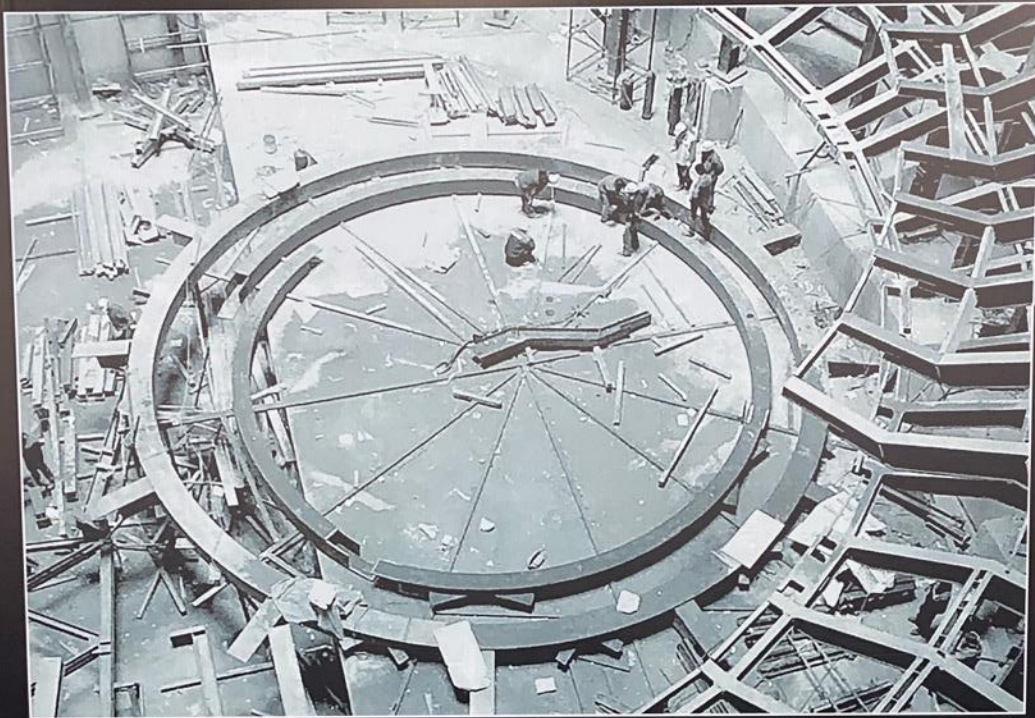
Construction process. Assembling the “Cradle of the world” made of steel structure prefabricated in Britain and assembled on site in Astana. Photo by the author 2025
